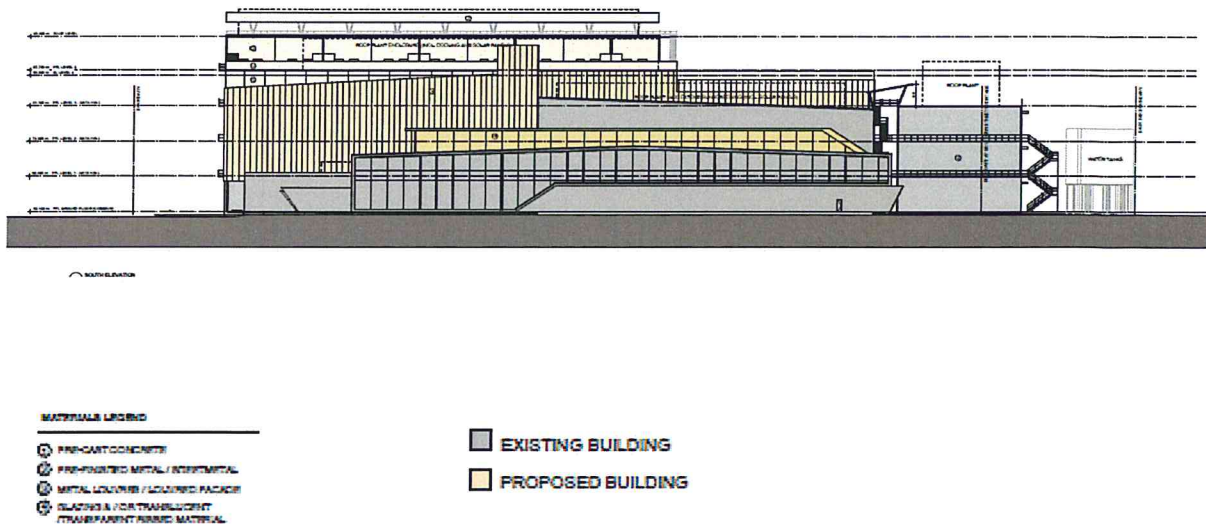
Southern elevation of proposed modified building, to Bellevue Circuit
